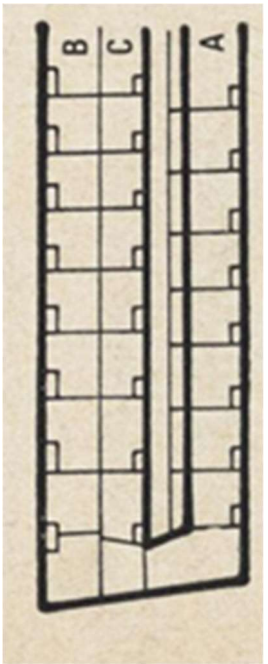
Shows labor slum housing plan example as A, B and C units in 19th century.
